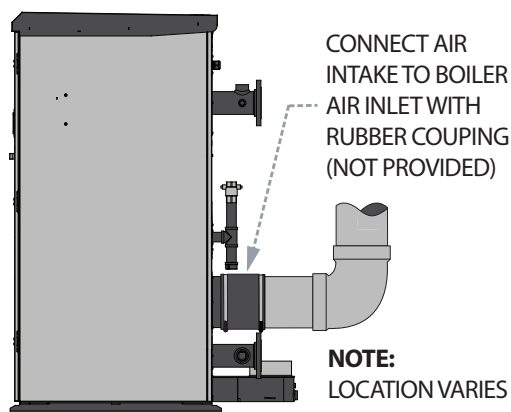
CONNECTING TO BOILER AIR INLET
